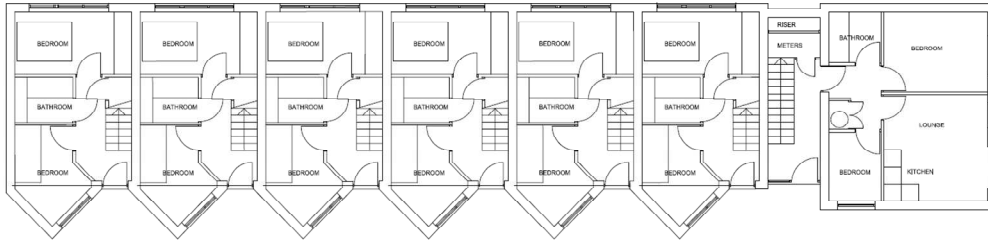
Floor plans of the dwellings (Simon Foote Architects 2008).
